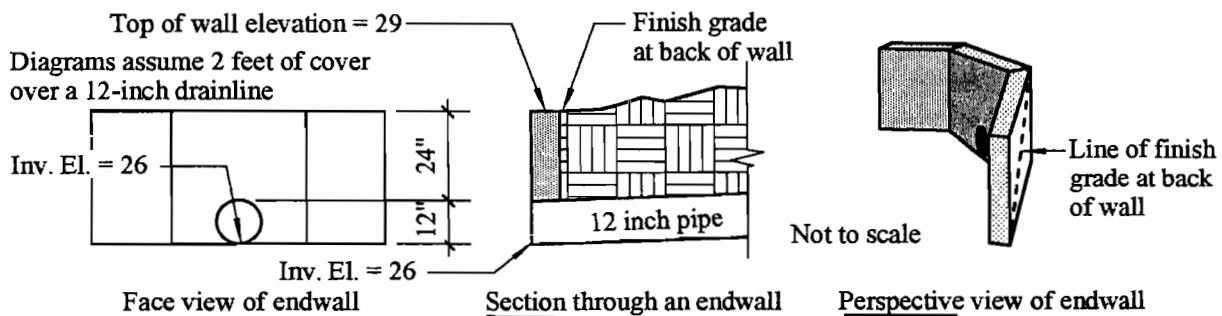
Elevation, Section, and Perspective View of Endwall
